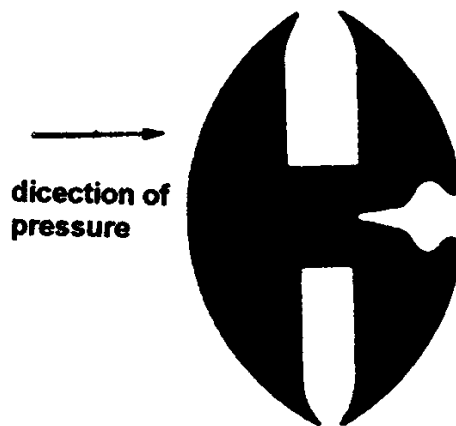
Rubber mouldings (cross section) for explosion panels
